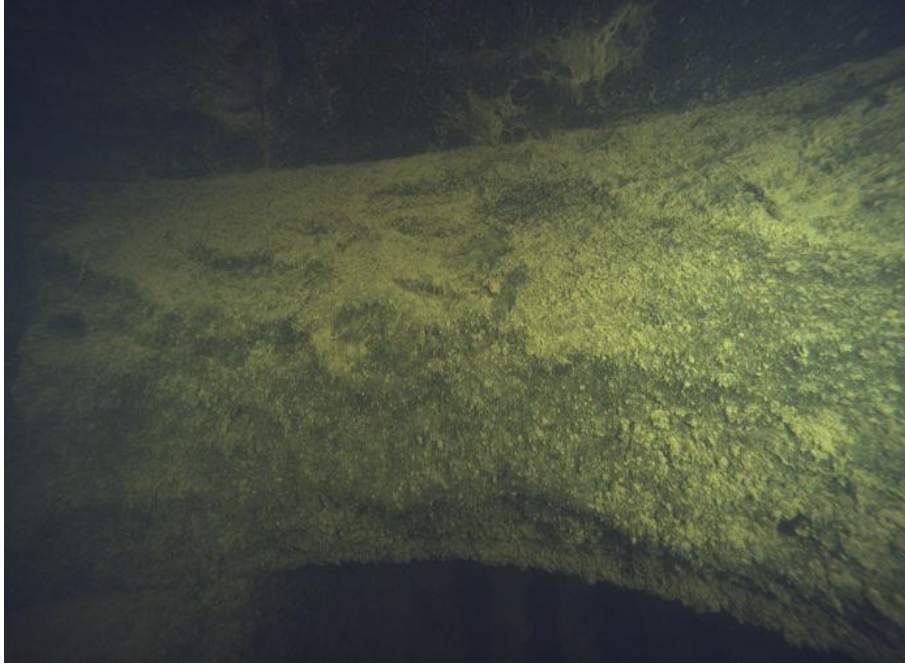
Example of stone blockwork near surface level at the western end of the outlet tower. The blockwork was found to be intact with no signs of major cracking observed. Grouting appeared to be in place with no instances of missing grout identified.
